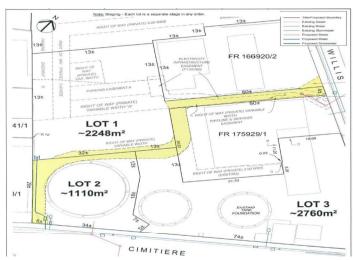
Section of Plan of Subdivision - 43682J-P05 in Appendix F
